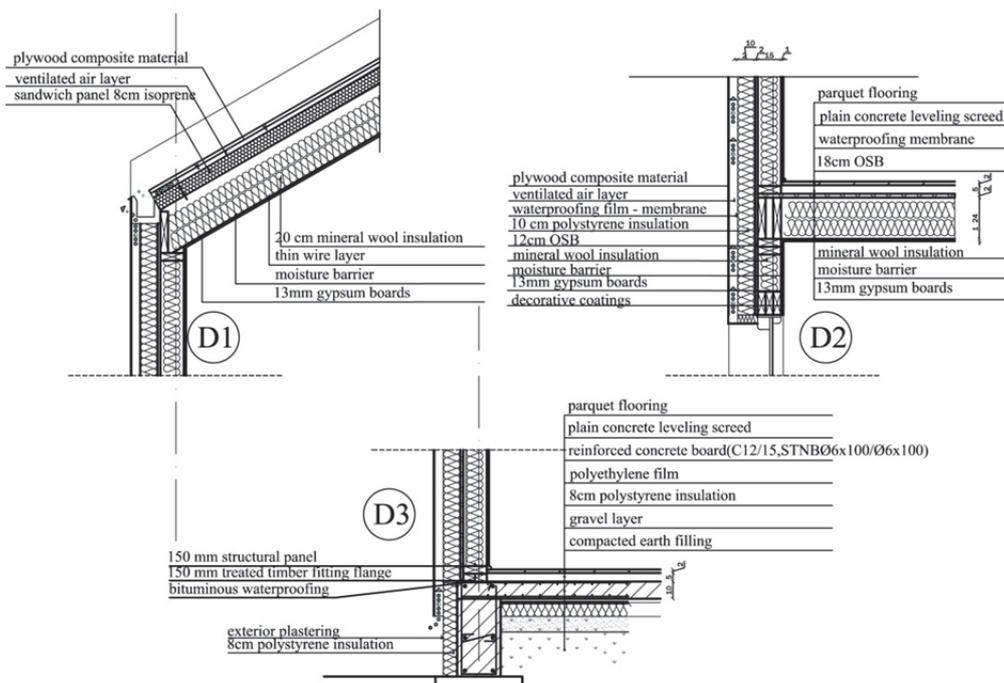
Construction details for the exterior wall: D1 – roof detail; D2 – interior slab detail; D3 – ground floor detail.
